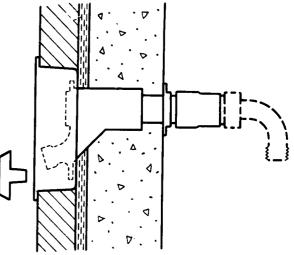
B RECOMMENDED INSTALLATION WITH VALVE BEHIND BUILDING WALL IN HEATED AREA TO PREVENT FREEZING (CONCEALED HEAD)
